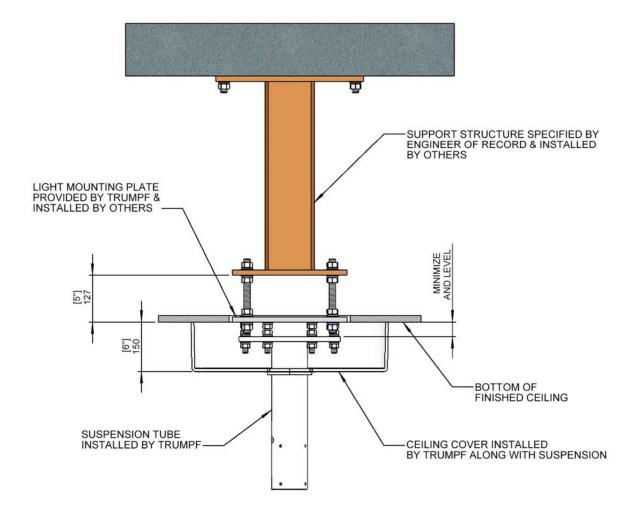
Structural Elevations for Light / Flat Panel with 6" Deep Ceiling Cover
